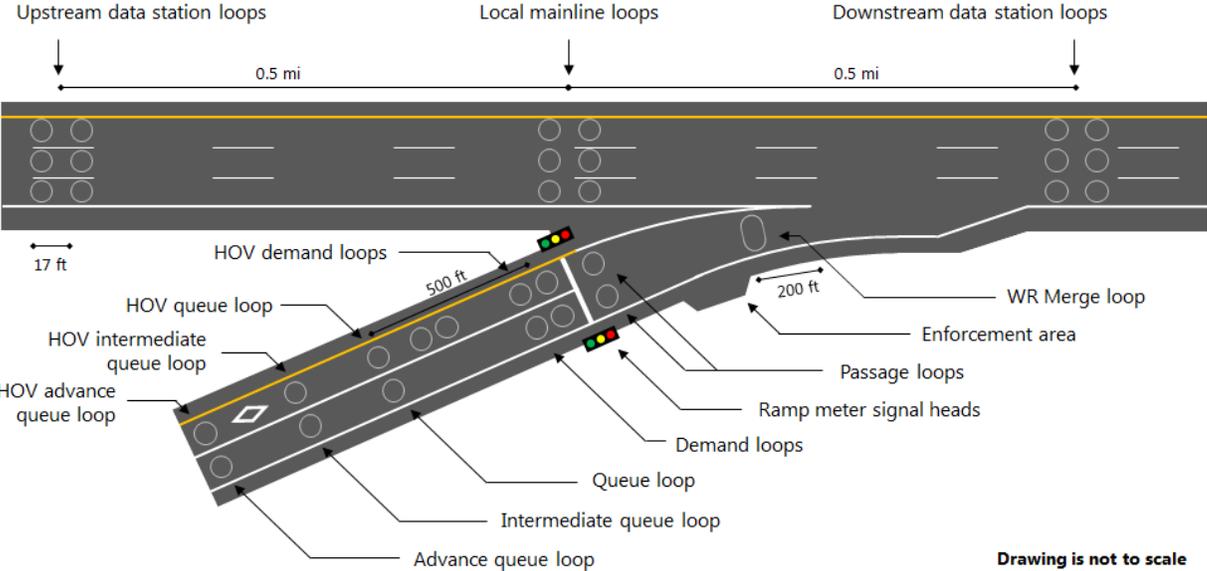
Typical ramp meter layout with HOV ramp metering
